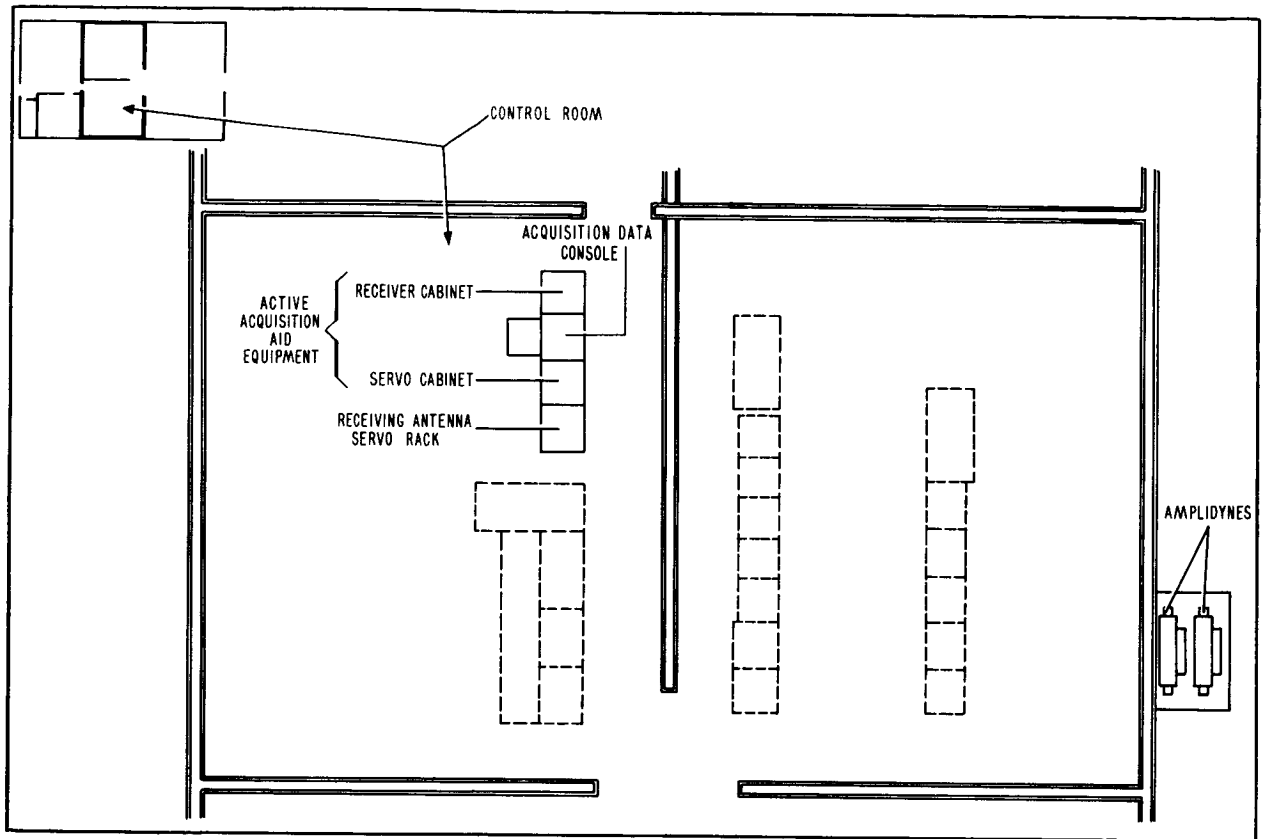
Acquisition System Equipment Layout, Telemetry and Control Building, Canton Island
